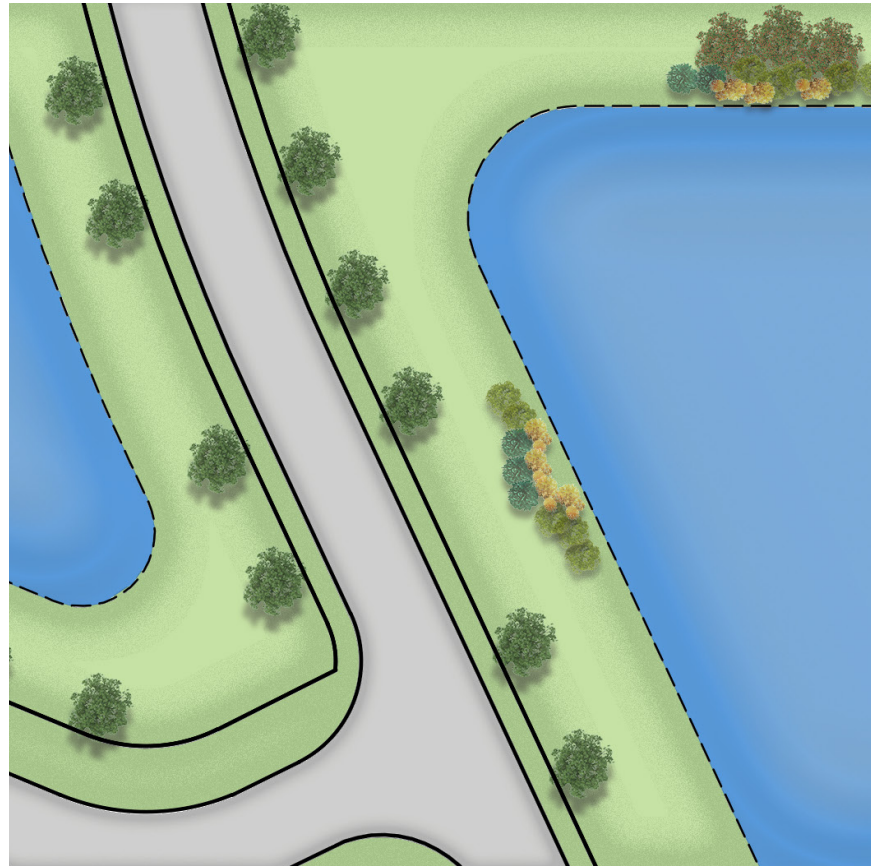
TYPICAL POND/LANDSCAPE INTERFACE
